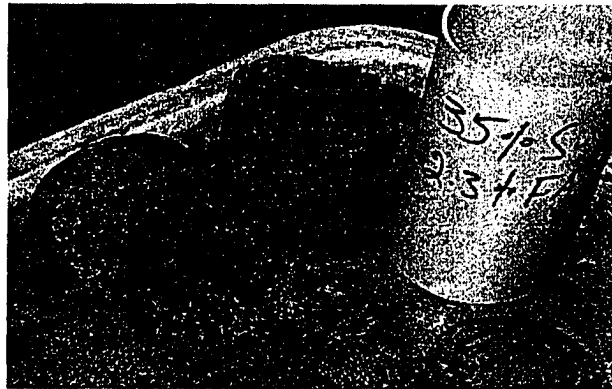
Construction joint on 35S2.3FA62.7C sample
